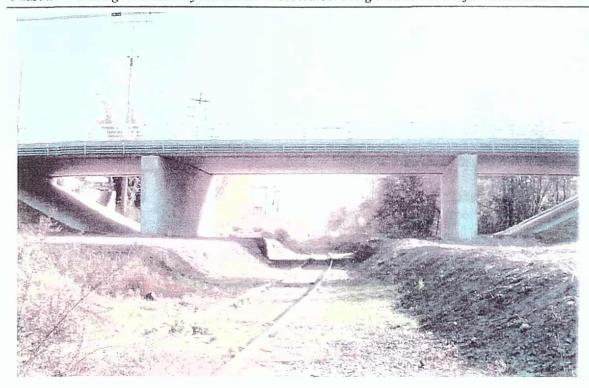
View east toward South Avenue Bridge. The Arlington Station was located on the east side of the bridge.
